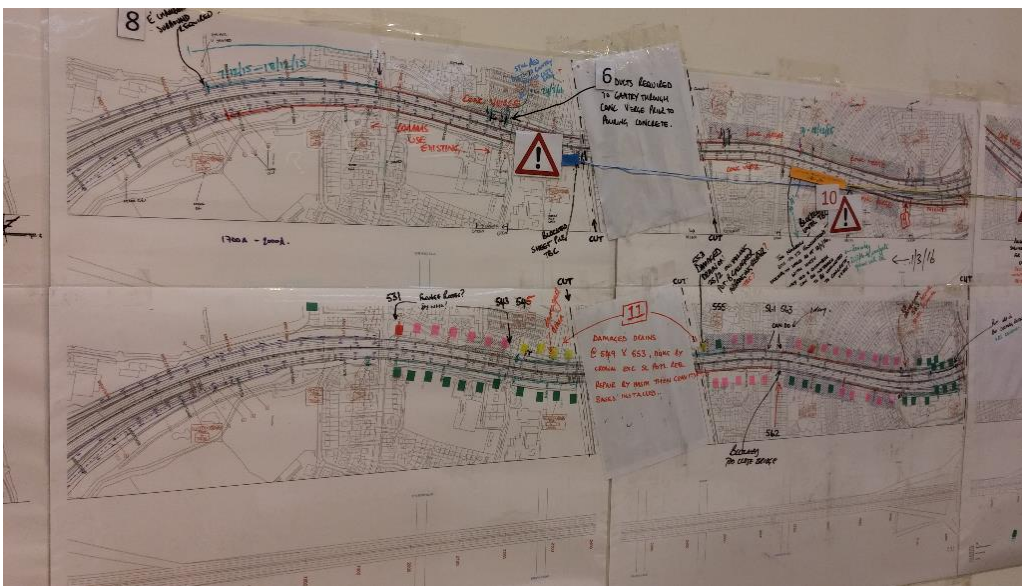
(b). A visual planning and control board devised as part of the Visual Management effort at a highways construction project for electrical construction works. The production progress, plan and issues can be tracked visually.
